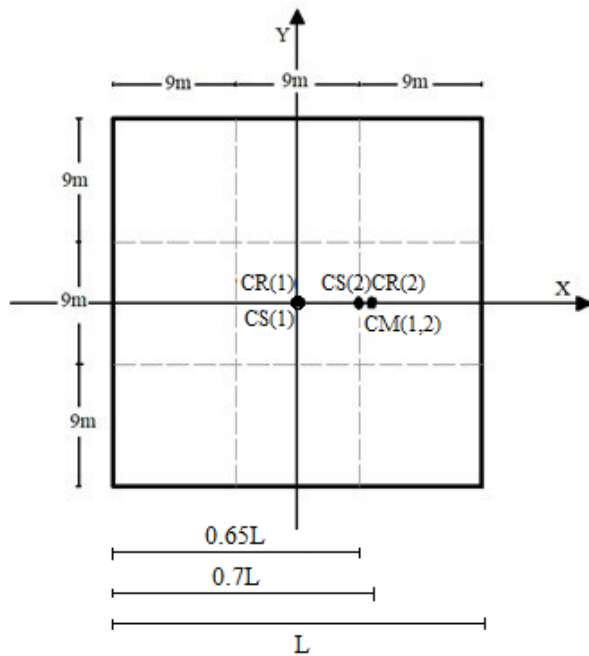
Centers' arrangement of the asymmetric building (AB) and the modified asymmetric building (MAB)
